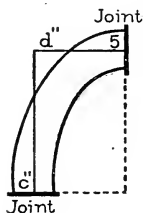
Drawing Mould when One Tangent is Level and One Inclined over Right-Angled Plan.
